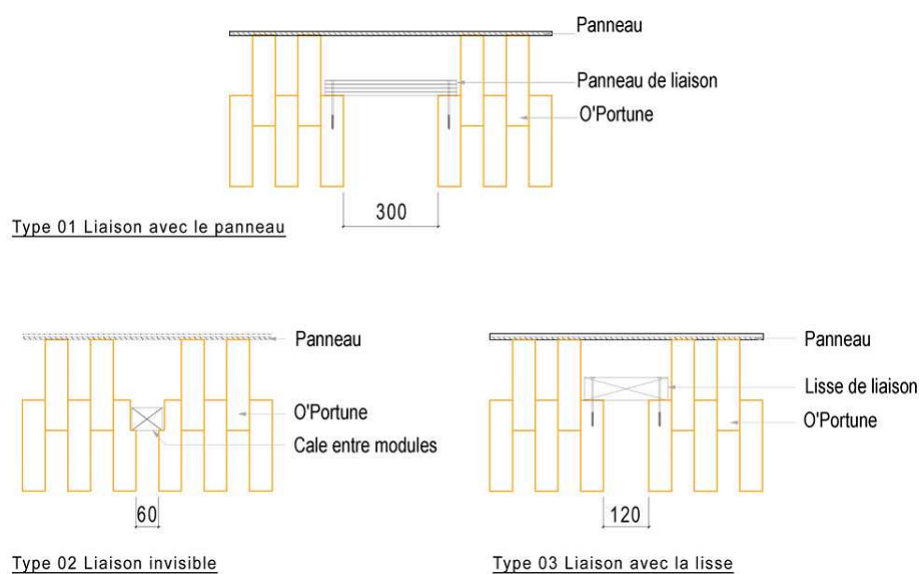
Cross-section of O'Portune® Floor System Variants
